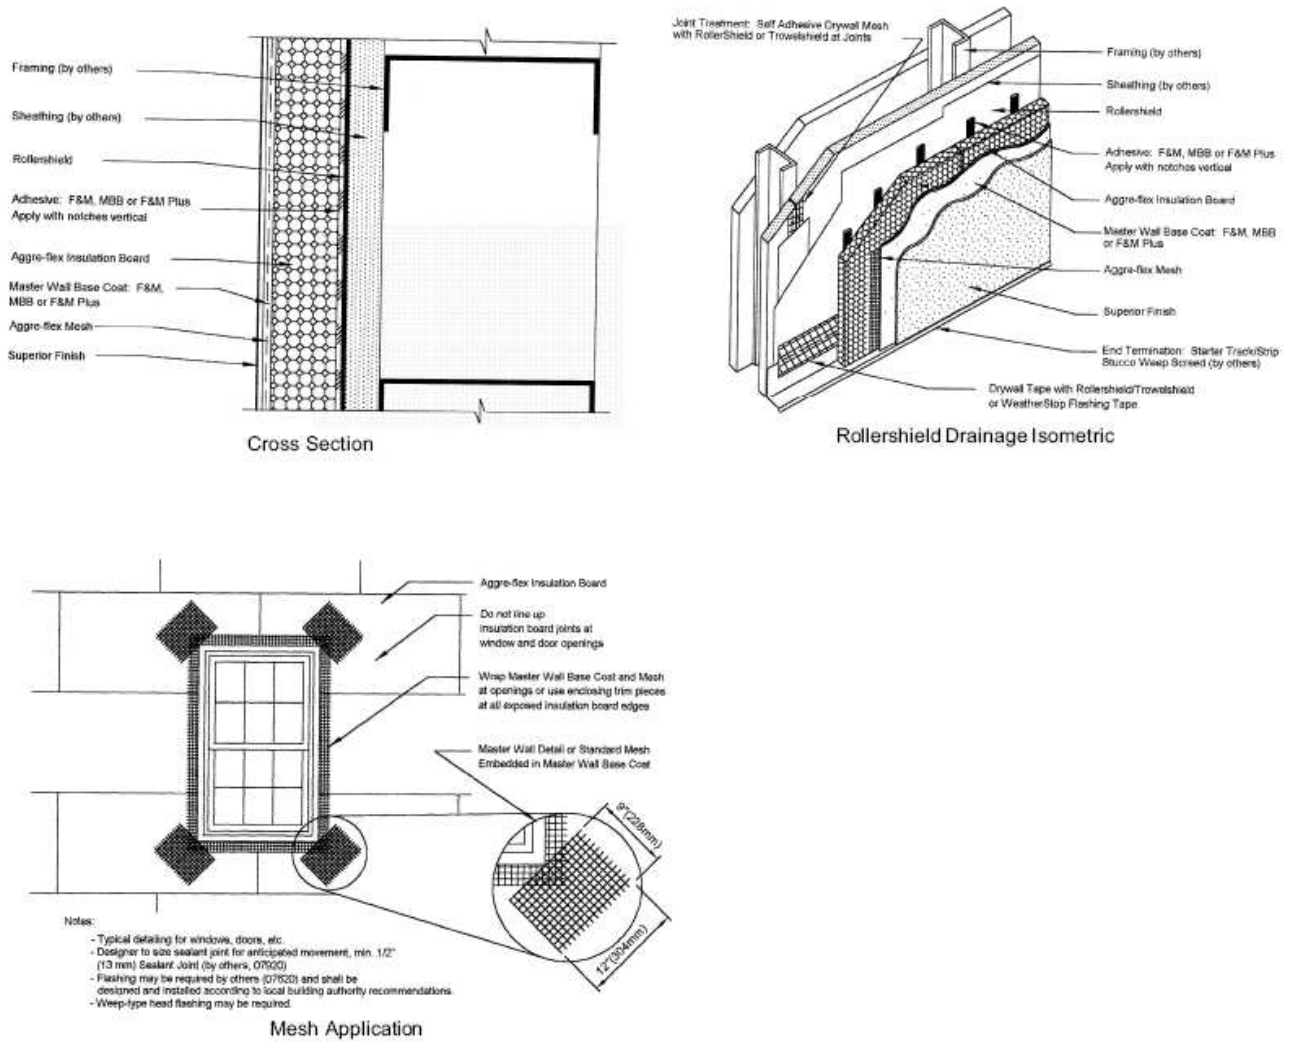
ROLLERSHIELD DRAINAGE SYSTEM
